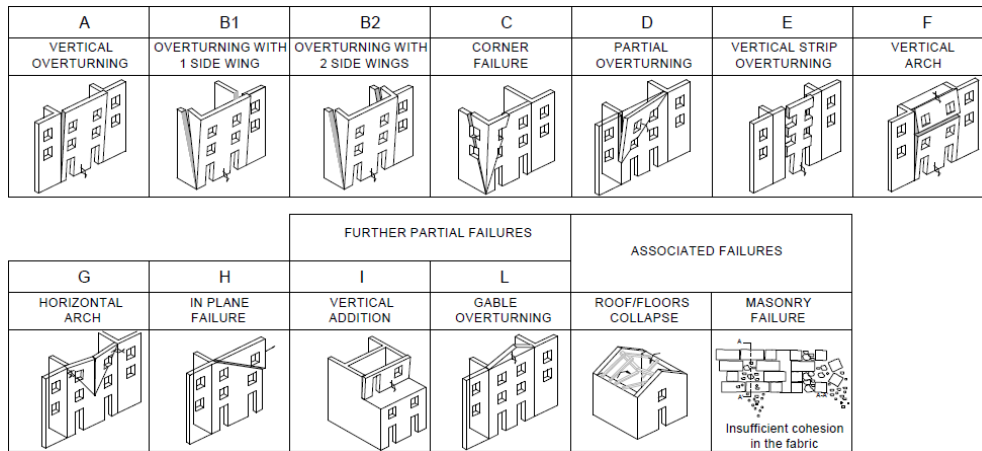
Schematic failure mode of out of plane collapse mechanism (D’Ayala and Speranza 2002)
